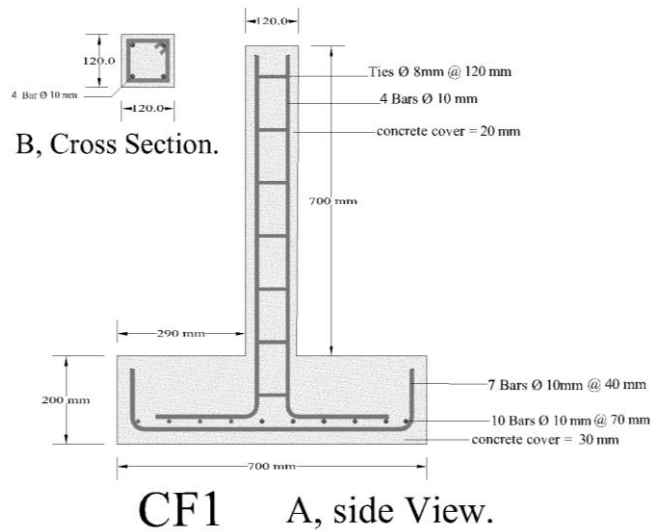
Details of steel reinforcement for the column- foundation reference (A) Side view (B) Cross-section
